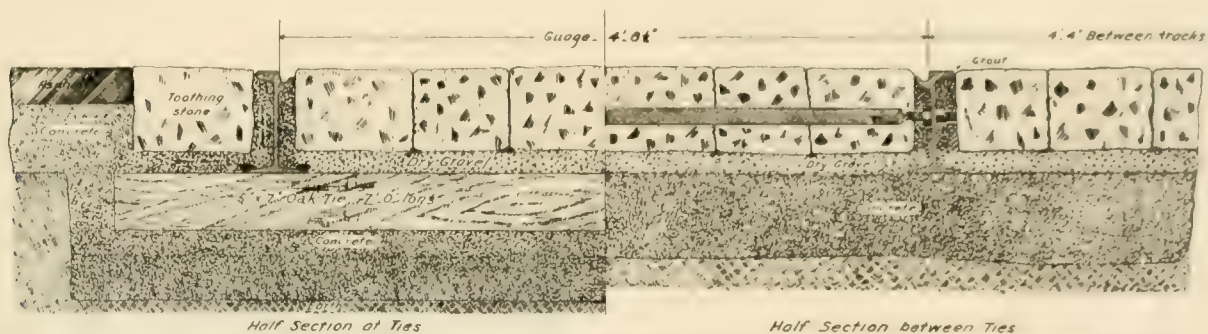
CROSS SECTION OF 9-IN. TRACK IN ASPHALT STREET—FIRST-CLASS BLOCK PAVING BETWEEN RAILS.
